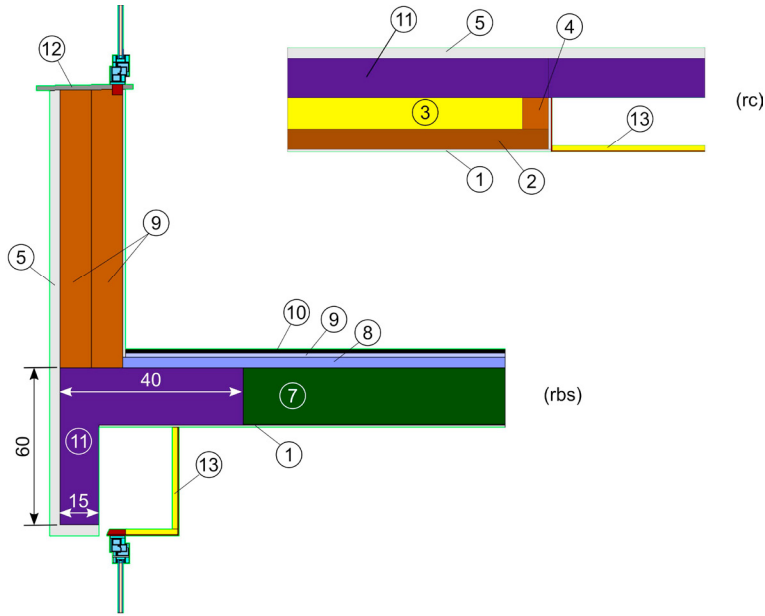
Roller shutter box-beam-sub window thermal bridge (rbs) and roller shutter box-current wall thermal bridge (rc).
